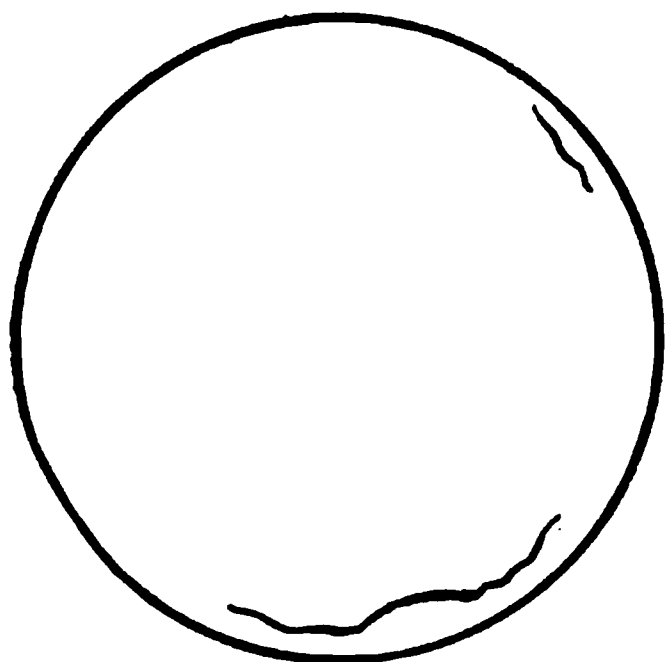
Expansion Cracks, Harmless in Air Pats.
